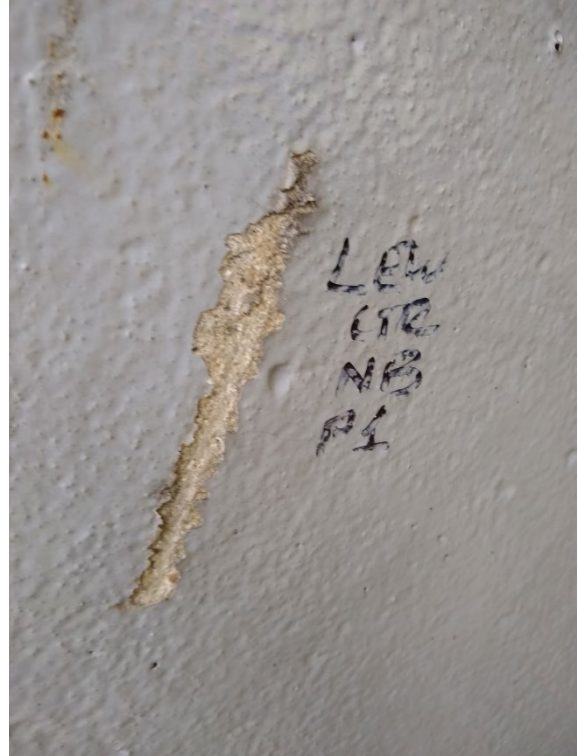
Damage to coating NB shoulder first pier; Del 71 498
